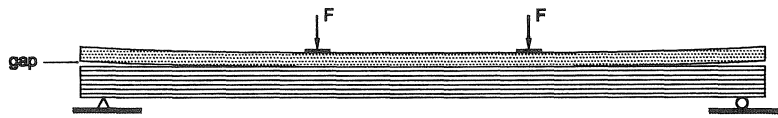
Gap between the timber beam and the concrete slab at the beam ends.
